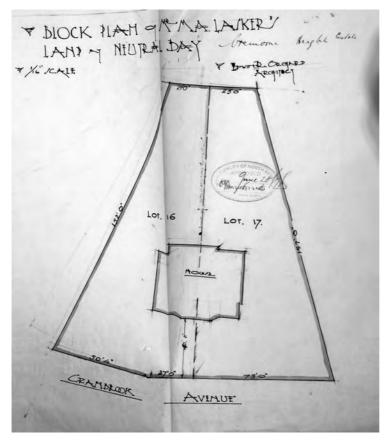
Site plan submitted to and approved by North Sydney Council in June 1917. The original intention was to erect a single dwelling within the two allotments. Source: Stanton Library Local History Collection (91/5.14. Box 14, Folder L, 1917-18, 17/2935)
